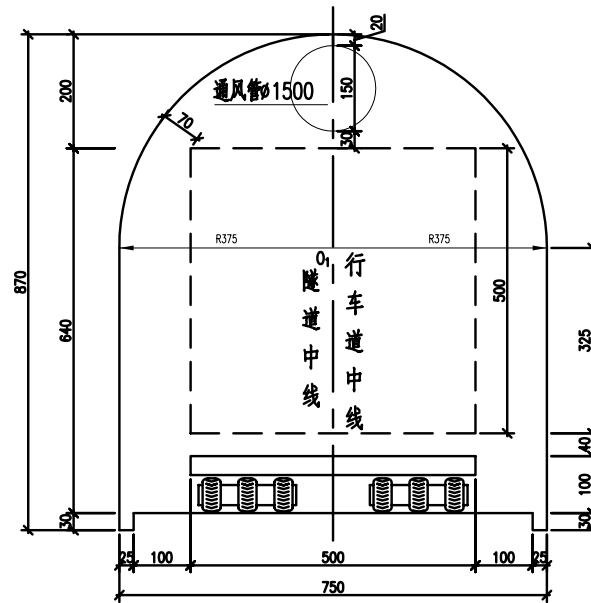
An engineering schematic diagram of the tunnel layout proposed by TSY. The dimensions are in cm.
